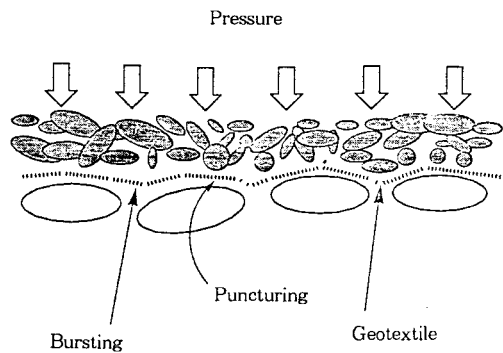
Typical situation of geotextile separator between fine soil and stone bed.
